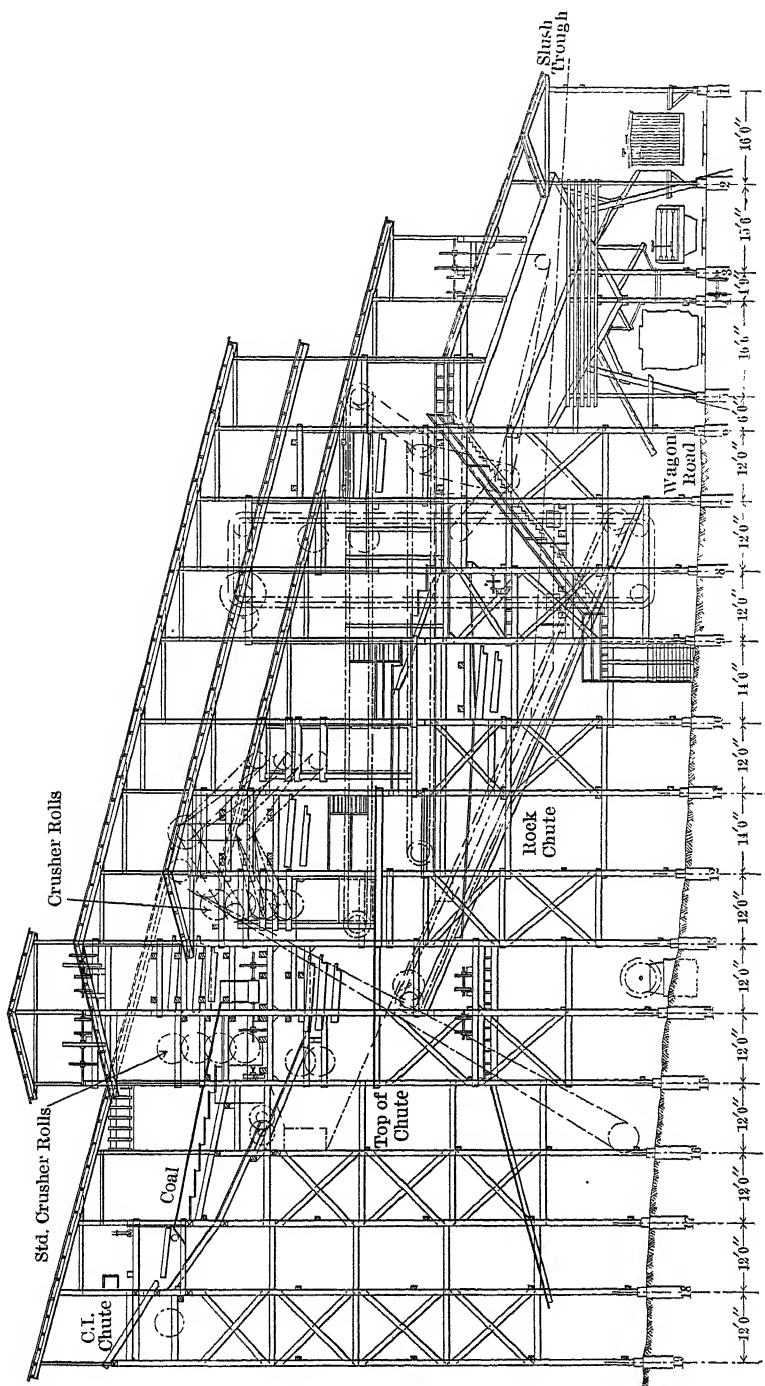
SIDE-ELEVATION OF TIMBER-CONSTRUCTED BREAKER.
